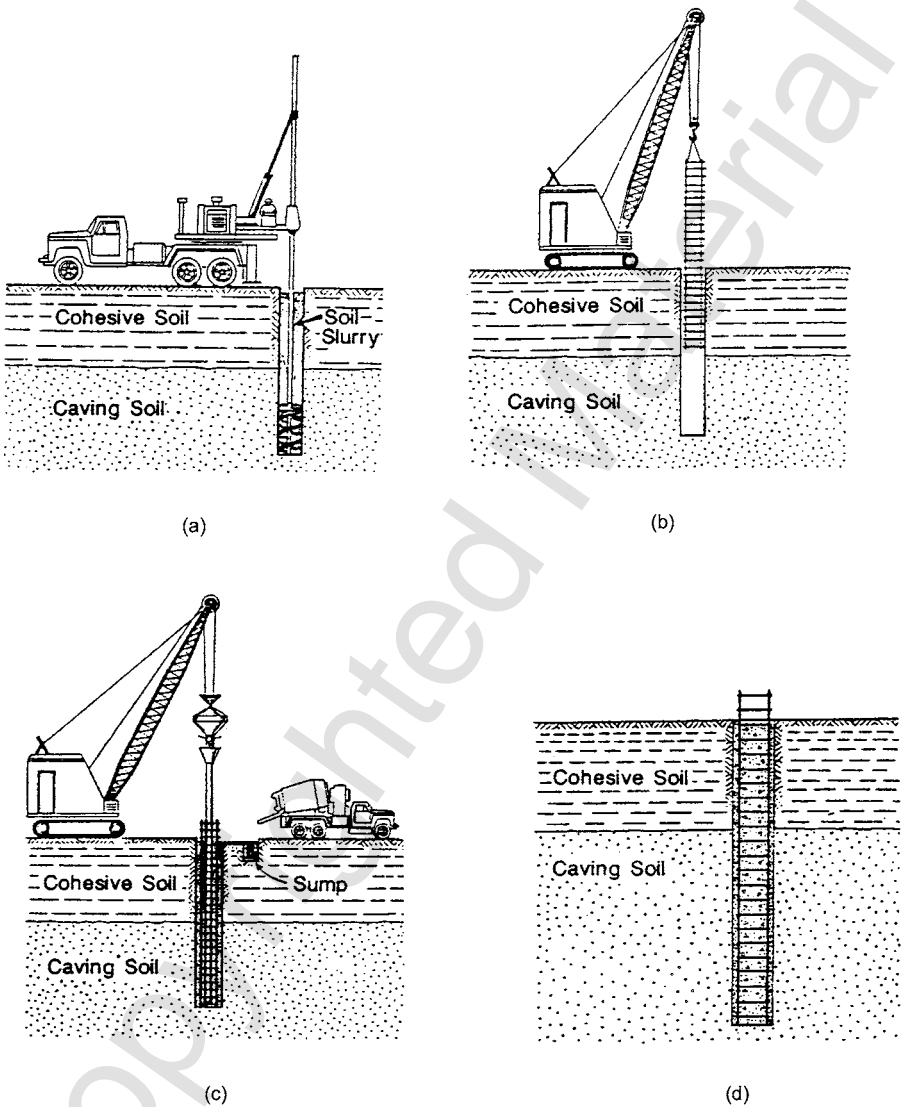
Slurry method of construction of a drilled shaft: (a) drilling into caving soil with slurry; (b) placing rebar cage; (c) displacing slurry with fluid concrete; (d) completed shaft (from Reese and O'Neill, 1988).
